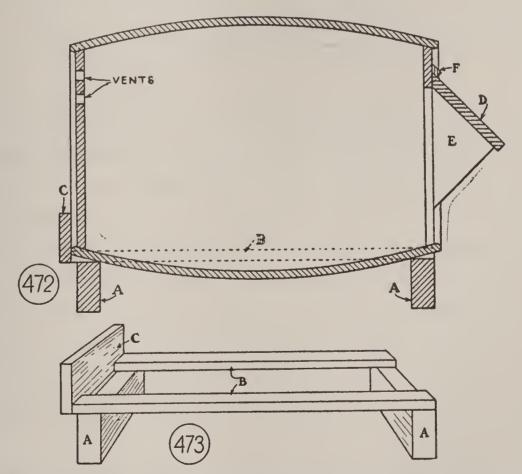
Cross-Section of Barrel Kennel Shown in Fig. 463. Fig. 473.—Detail of Cradle.
